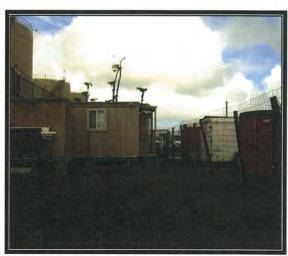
LenGo construction office. Cruiser Phil's bike trailers to the right.
